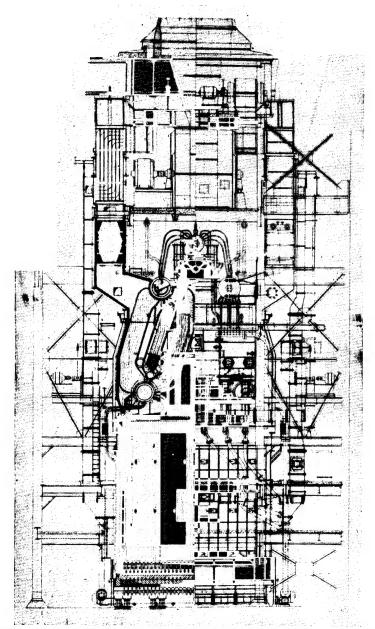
1400-lb. pressure steam-generating unit at River Rouge Plant, Ford Motor Company. (Courtesy Combustion Engineering Company, Inc.)
